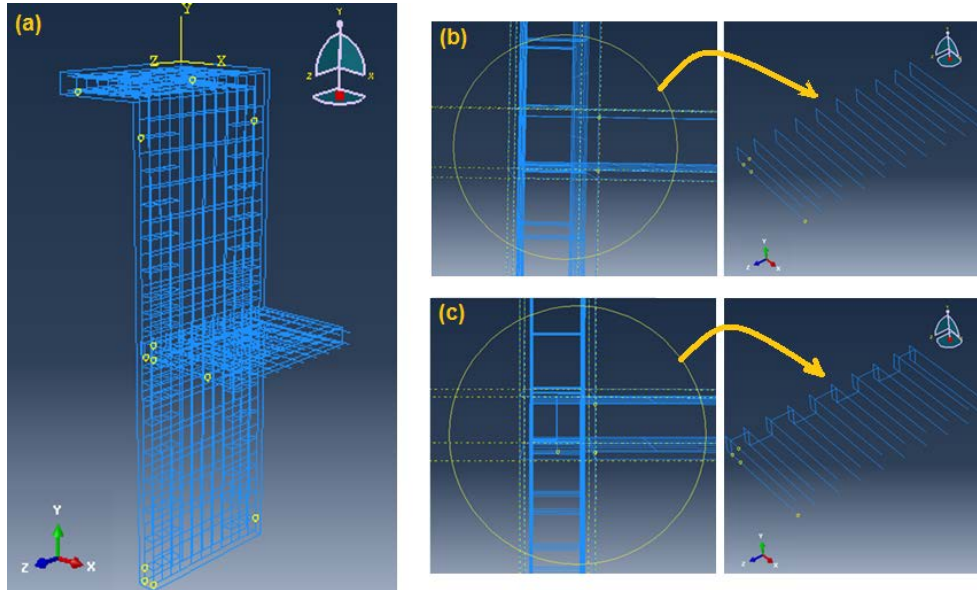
(a) FE model of wall-slab subassembly; (b) Model of U type joint; (c) Model of A type joint.
